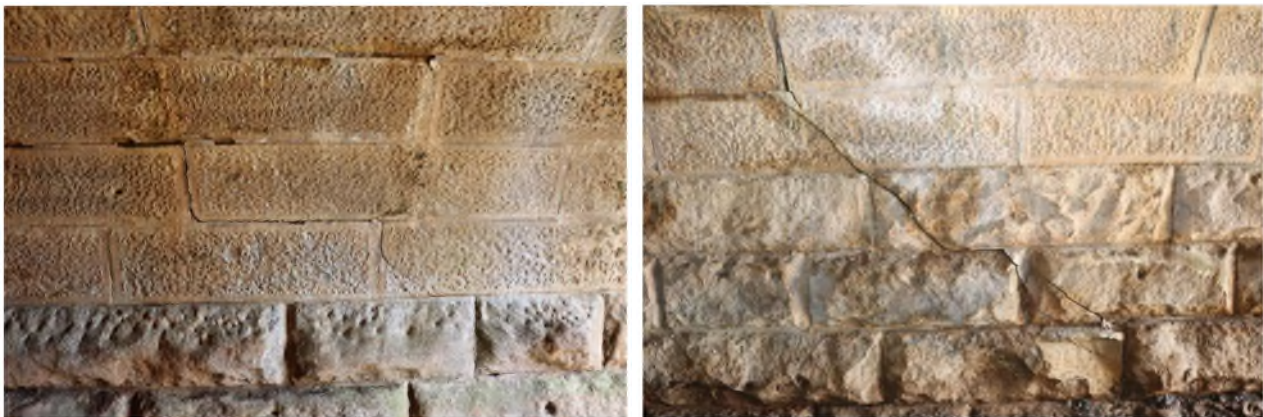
Cracking in the barrel of culvert 88.400 km. This cracking has formed during the mining of the Western Domain.
